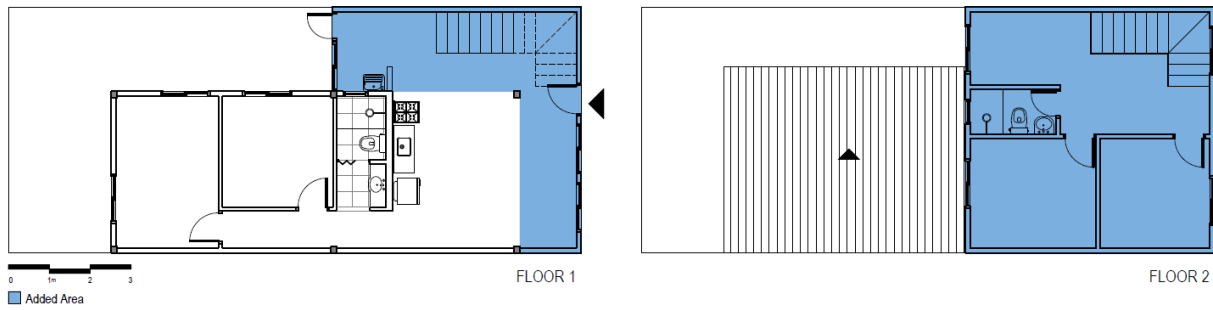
Expand kitchen/living room to front and side + add room to front (left) + add laundry (right).
